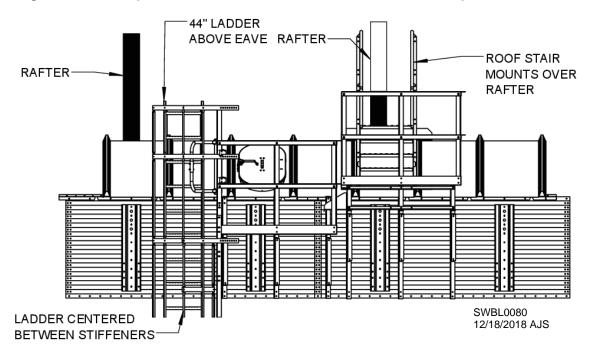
Ladder & platform locations with 2 stiffeners & 4 roof sheets per sidewall sheet
